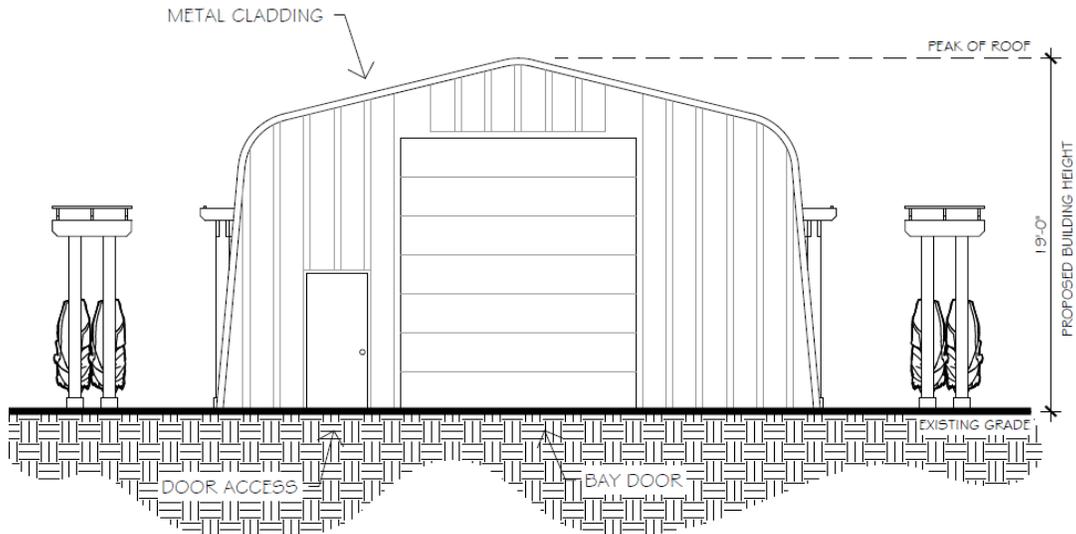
South side elevation; as seen from Townhouses at 624 Shaw Road
